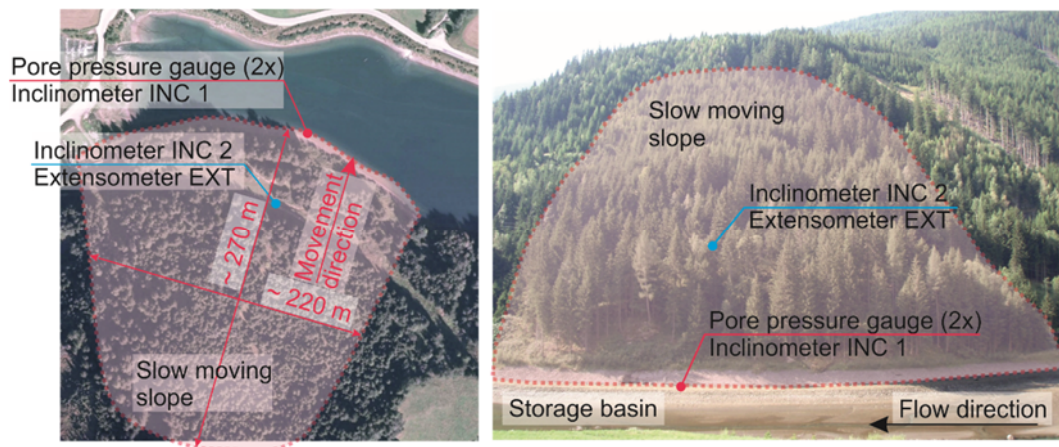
Plan view and side view of water storage basin and slow moving slope
